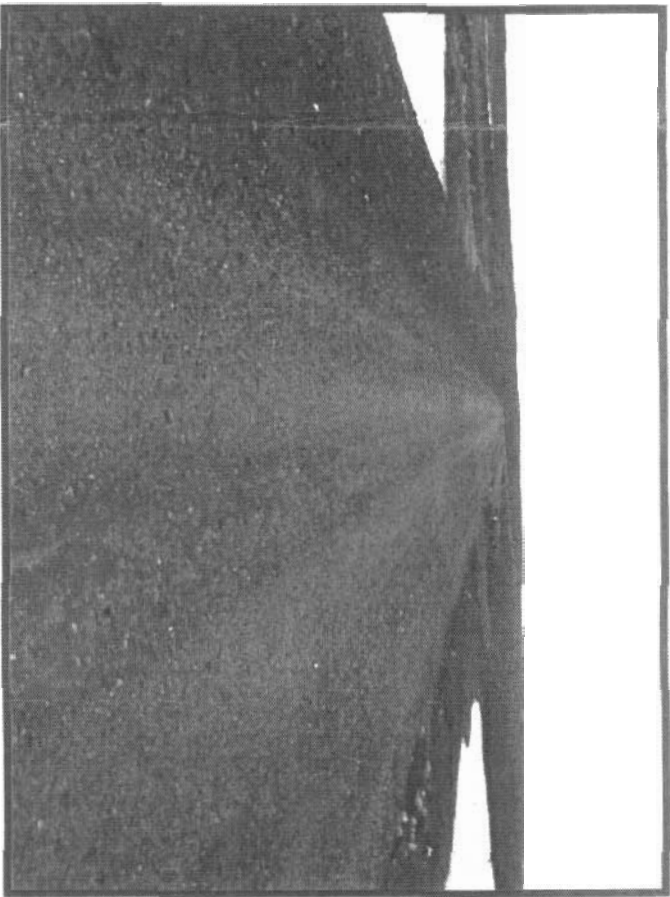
shows a view looking towards the south abutment. The crest appears to be smooth and flat with no signs of cracking or settlement.
